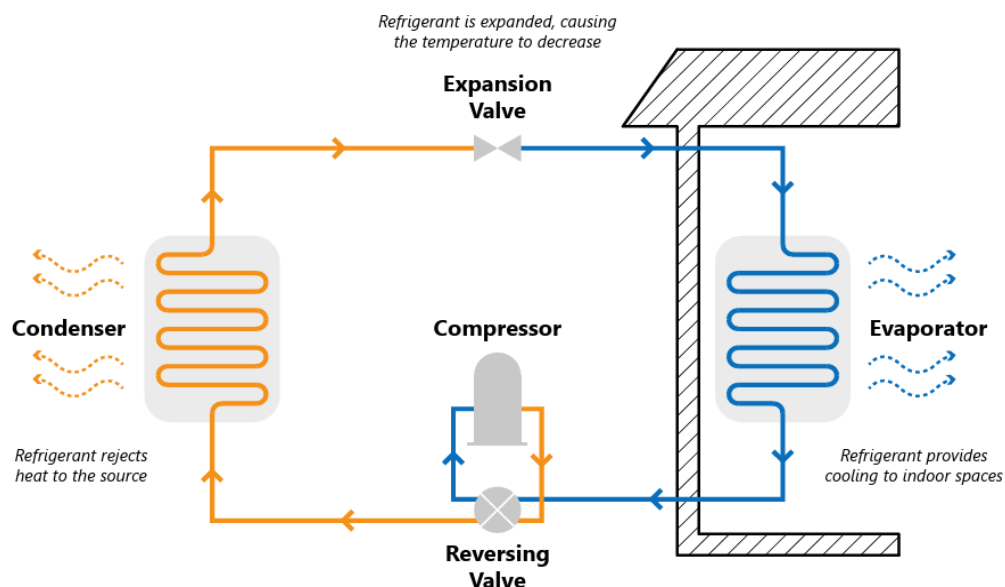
HEAT PUMP PROVIDING SPACE COOLING
